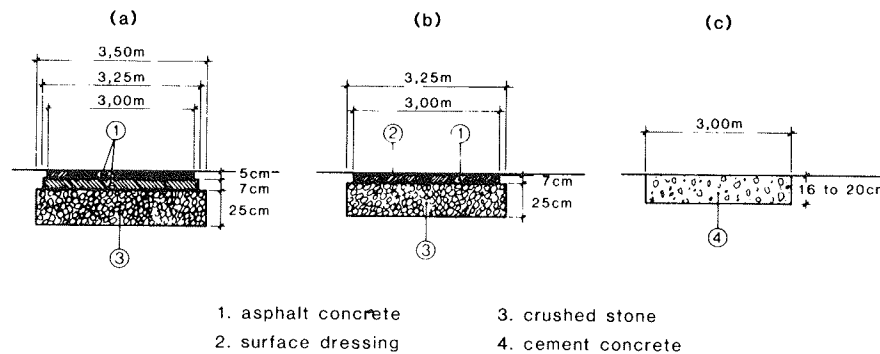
Typical structures of asphalt or cement concrete rural roads.
